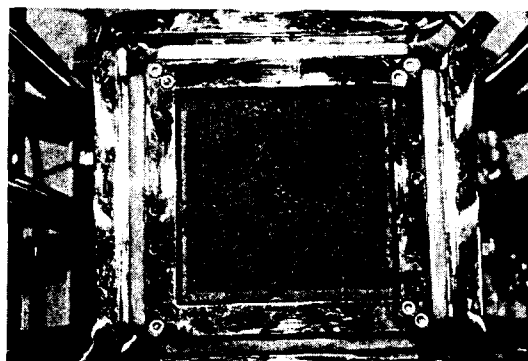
Photograph of a specimen after fracturing. (Second series)
